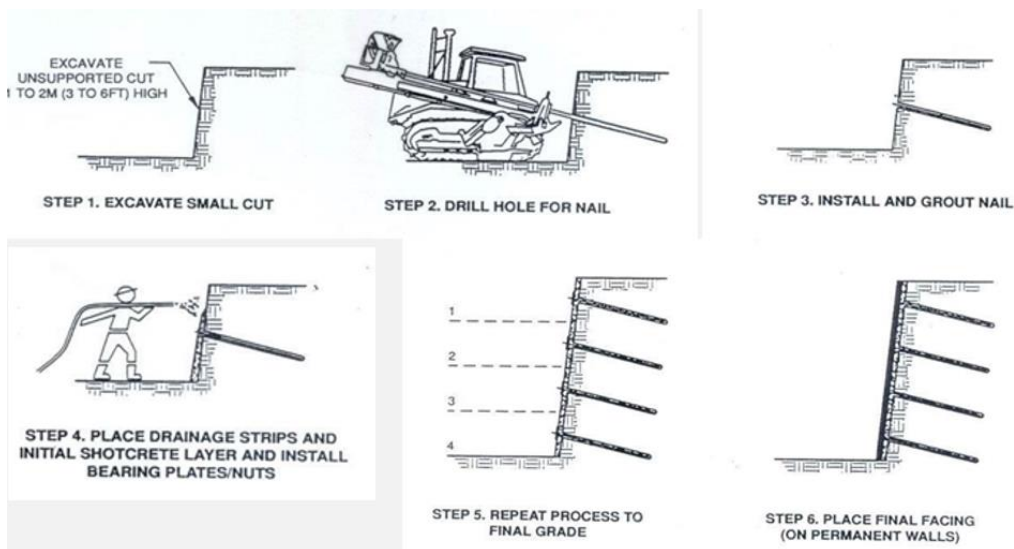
Stages of Construction of a soil nail/shotcrete wall
